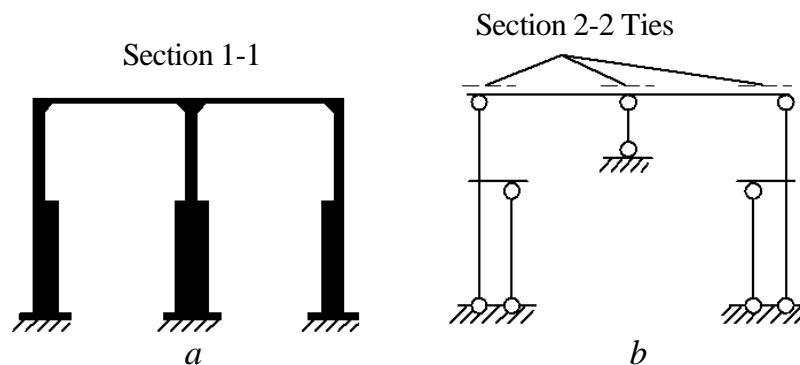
Layouts of lateral members of heavy two-span shops
